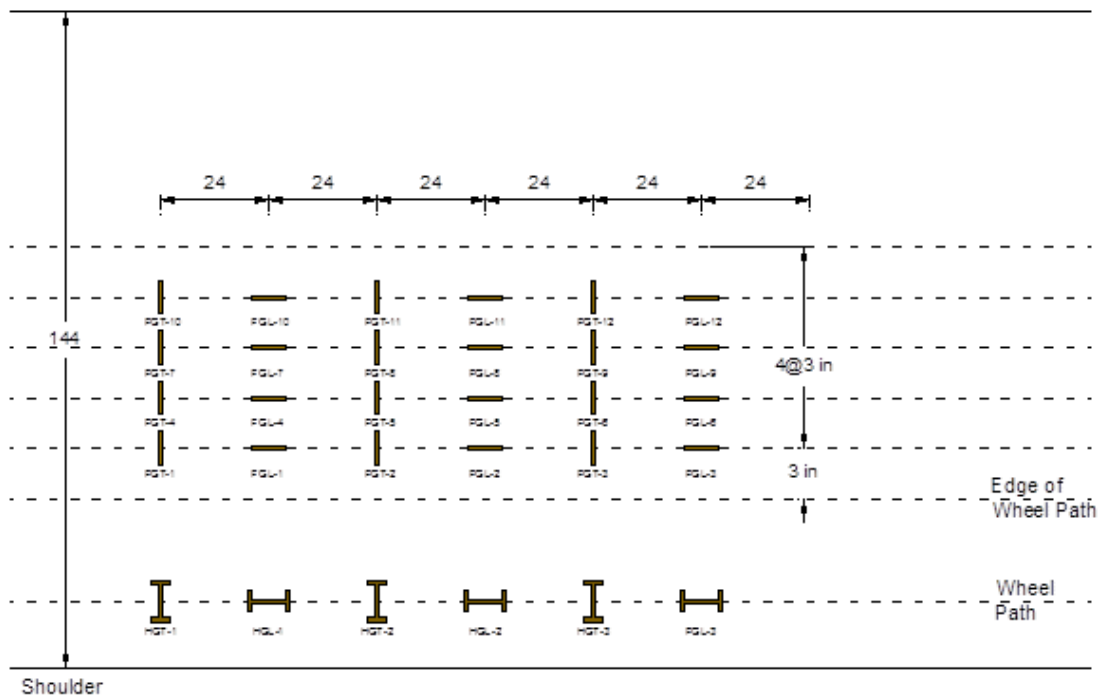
Illustration. Plan view of pavement structure and instrumentation for the test track section.
